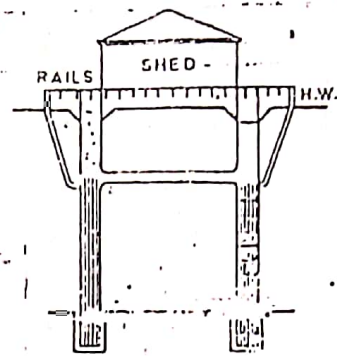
Typical RCC Cylinder Pier Jetty.
